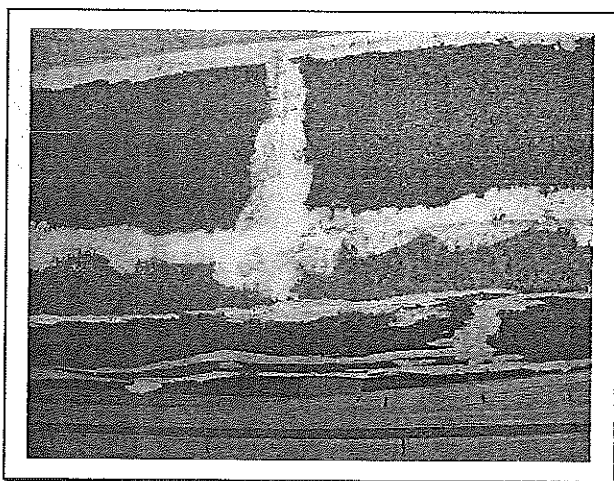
Viewing white mastic on cork air ducts, Attic.
